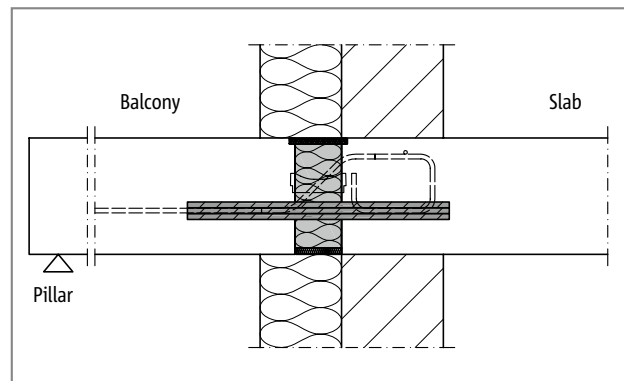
Schöck Isokorb® T type H-VV-NN: With T type K-E, K-T; connection for exterior insulation
